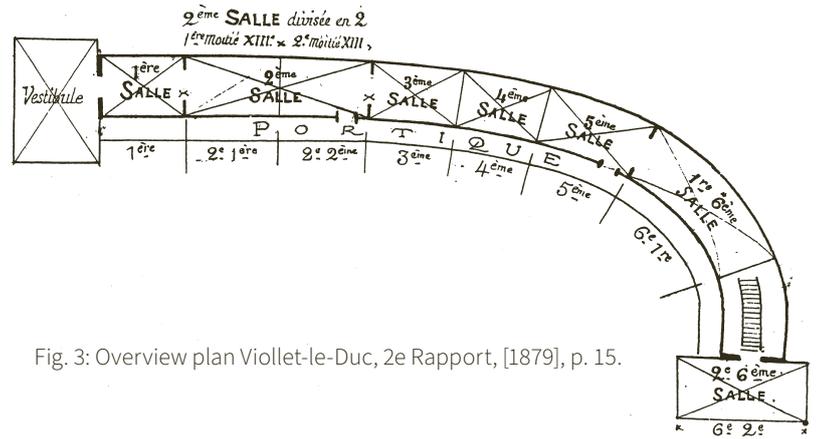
Overview plan Viollet-le-Duc, 2e Rapport, [1879], p. 15.
